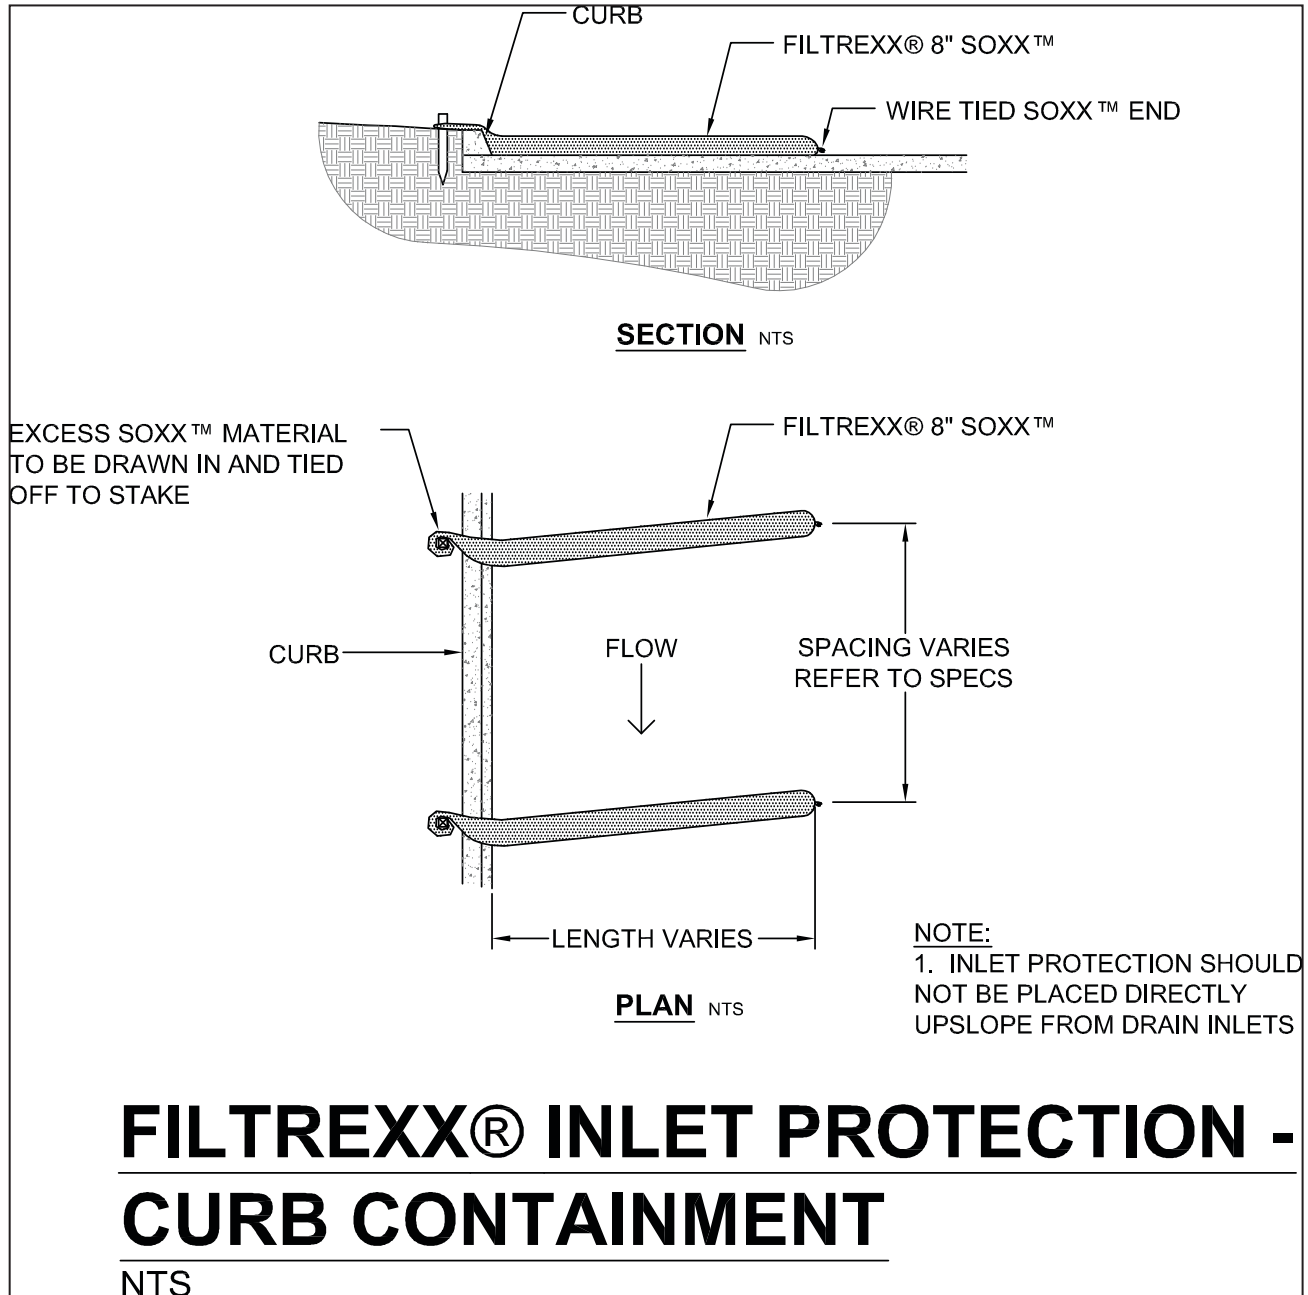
Engineering Design Drawing for Curb Sediment Containment Inlet Protection
